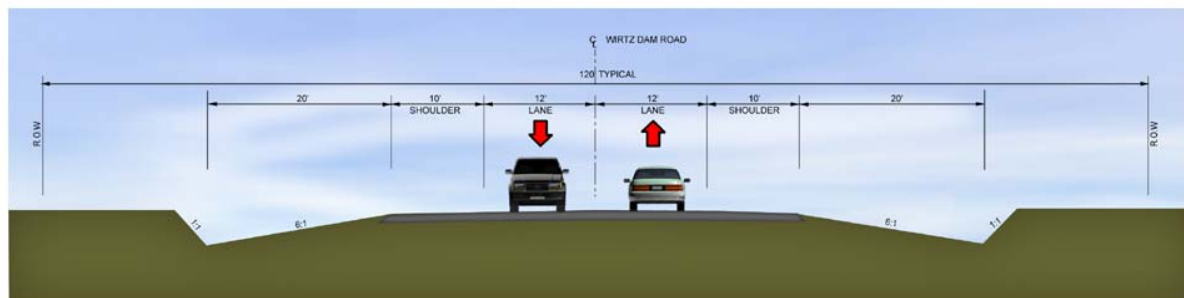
Wirtz Dam Road Looking North Towards FM 1431
